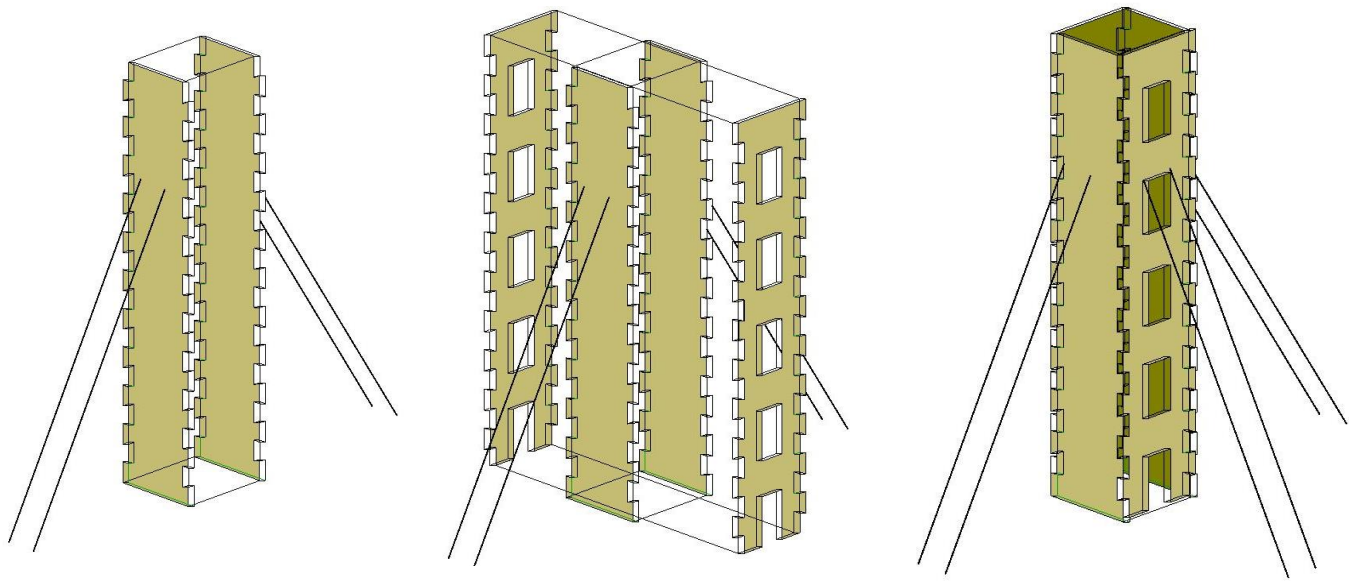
Possible solution for assembly steps of CLT shear walls with temporary bracing
